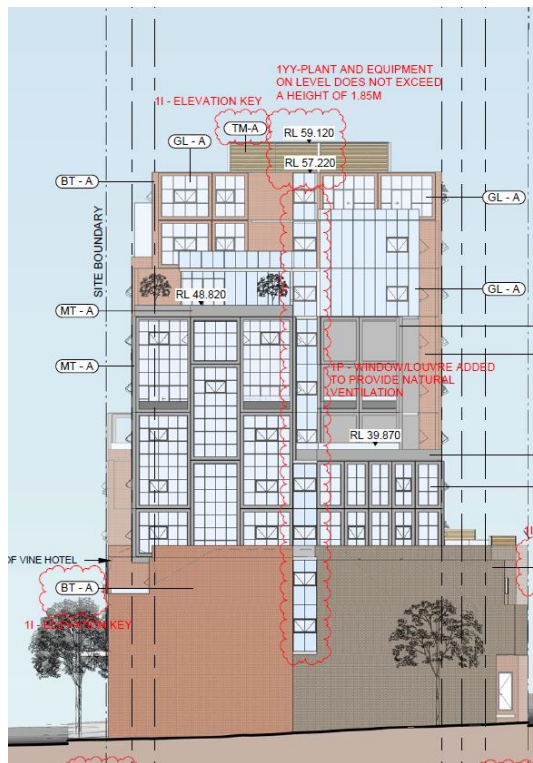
Northern elevation of PLN16/0922 – 1-57 Wellington Street & 71-77 Victoria Parade
